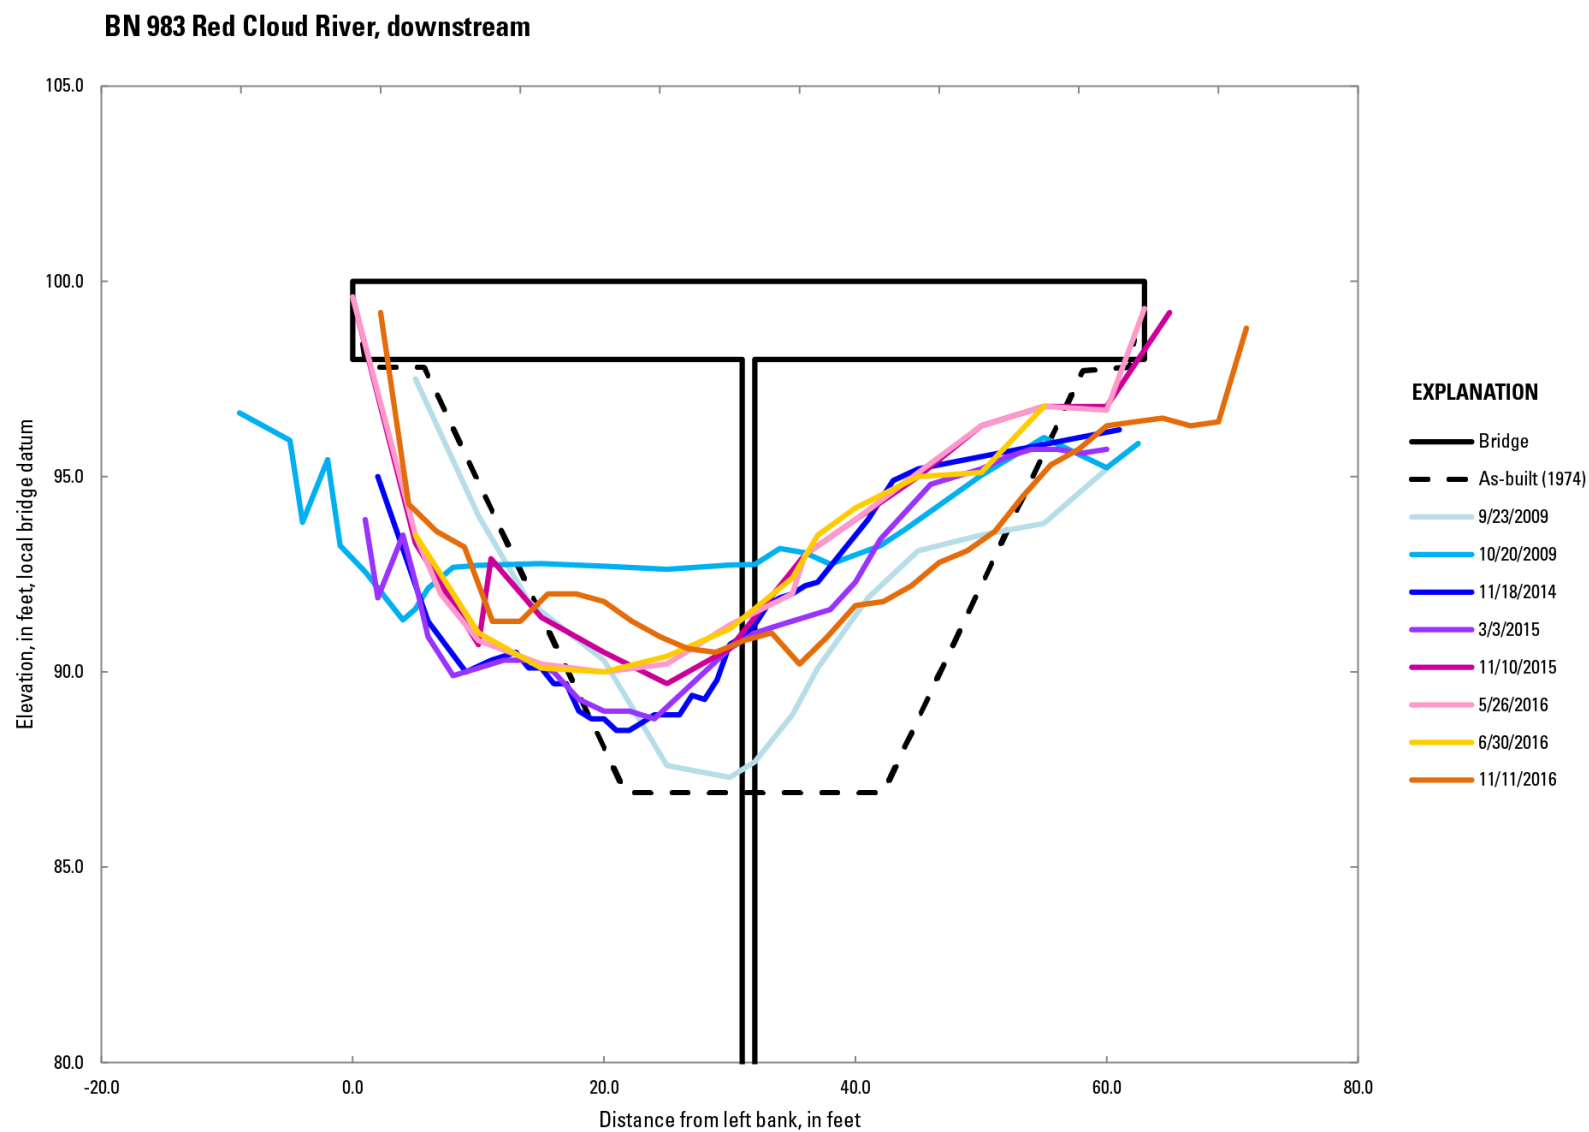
Cross sections showing downstream soundings at bridge 983, Red Cloud River, Alaska, 2009–16.
